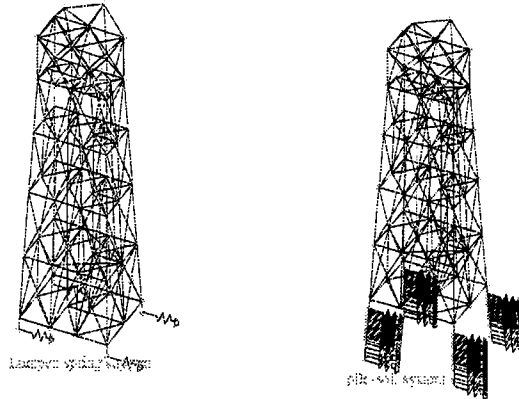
Lumped spring to ground and pile-soil foundation models
